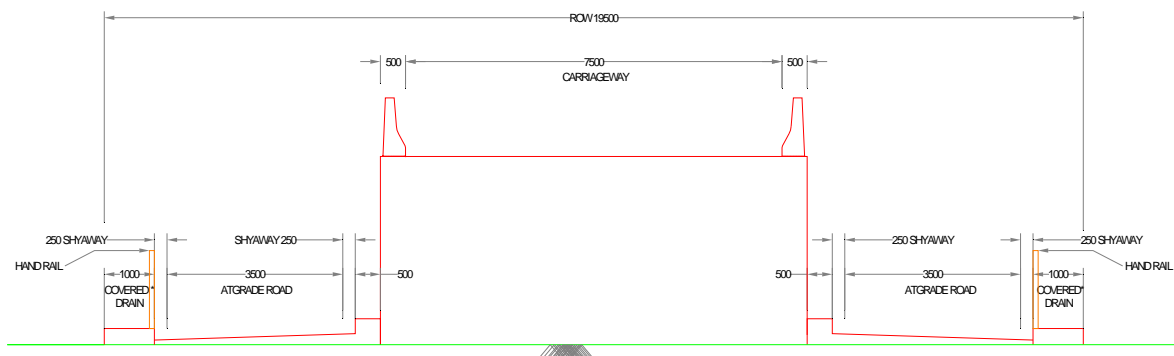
TYPICAL CROSS SECTION- TYPE-12
